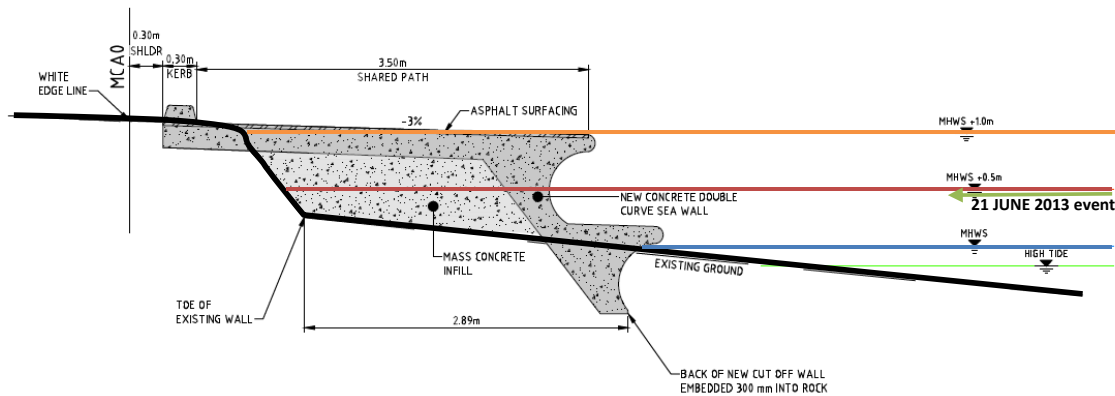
Schematic of existing seawall along with proposed seawall at Point Howard Beach showing MHWS elevation after periods of sea-level rise. Note that storm-surge and wave effects will be superimposed above the elevations shown. Cross section at Chainage 1060m.
